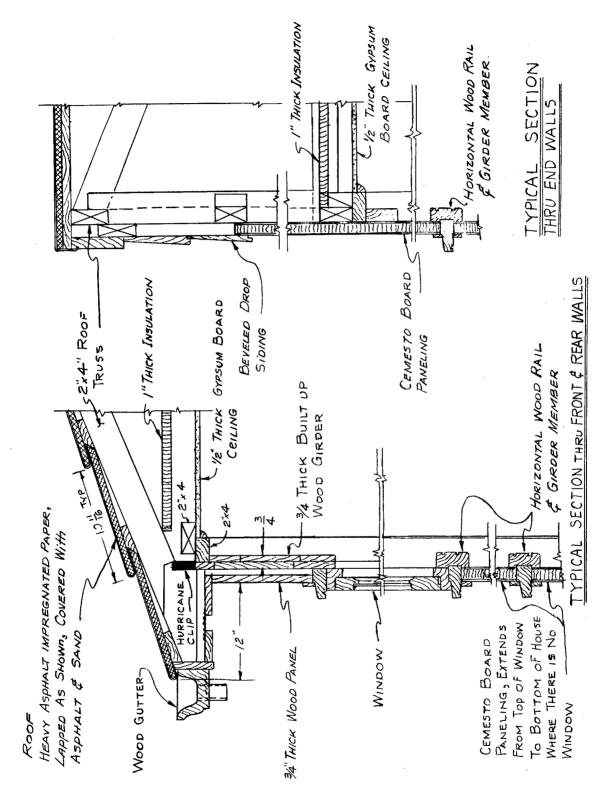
Cross sections of typical Cemesto wall construction.
